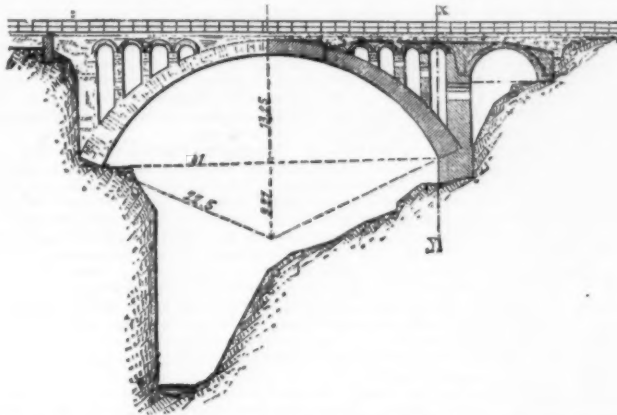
WALDLITOBEL VIADUCT.—LONGITUDINAL SECTION AND ELEVATION.
